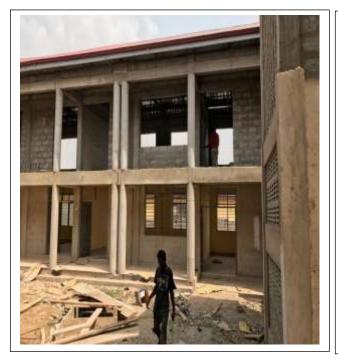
Construction of 12-Unit Classroom Block for Manhean Presby School
